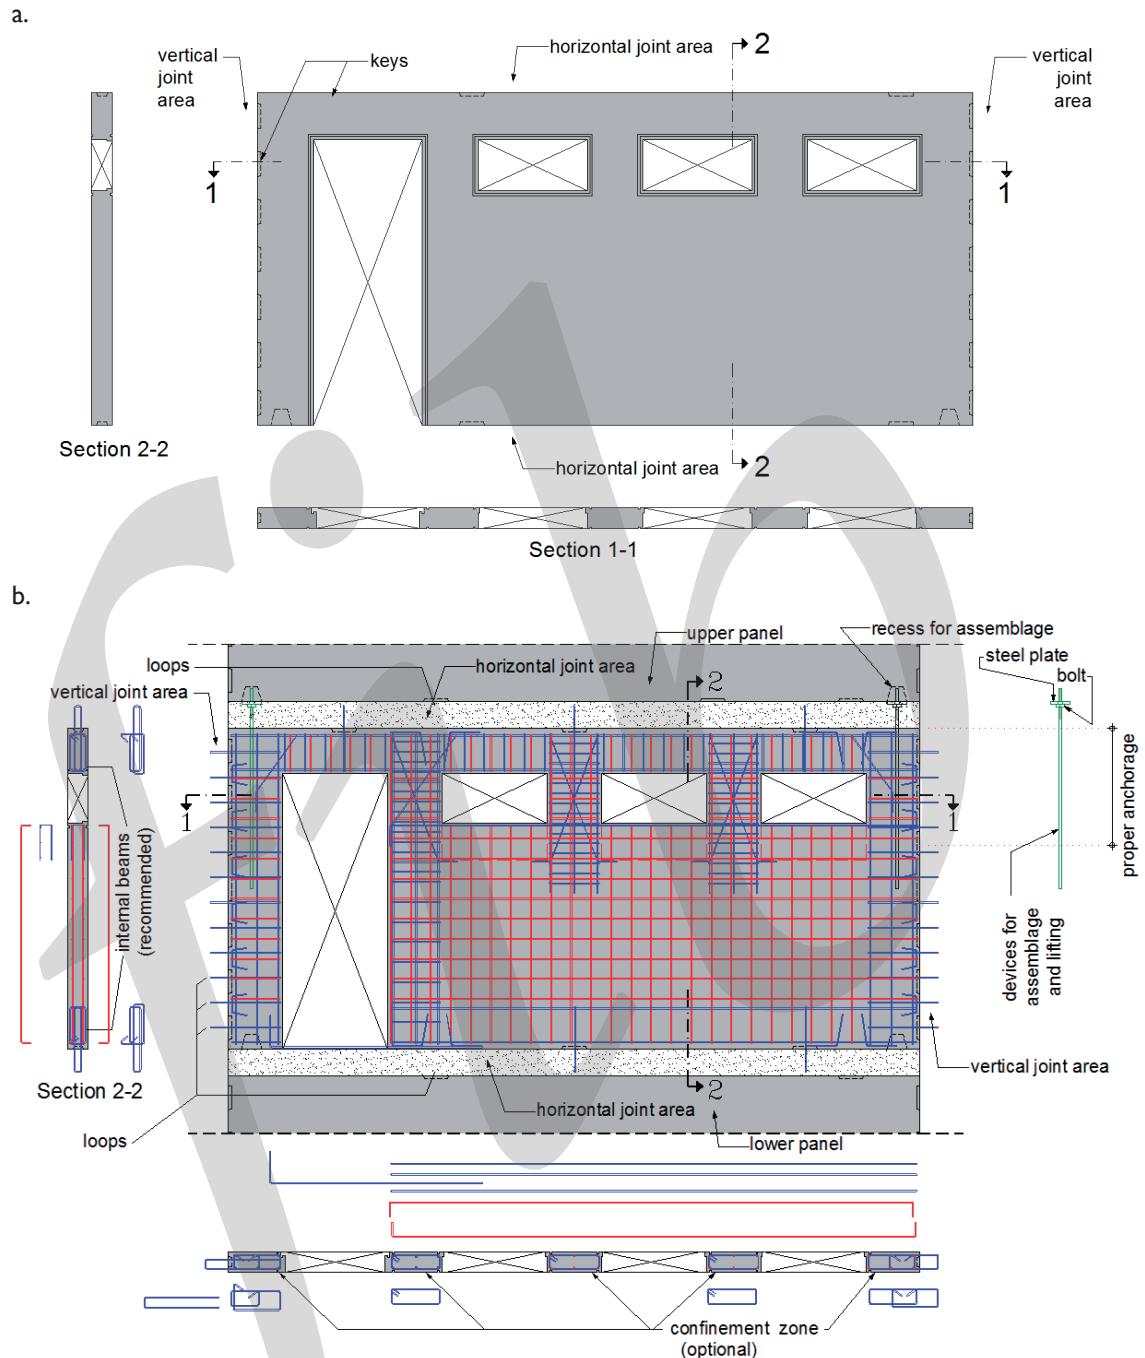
a. Geometry of wall panel with 4 openings where key density along vertical joint is about 50%
